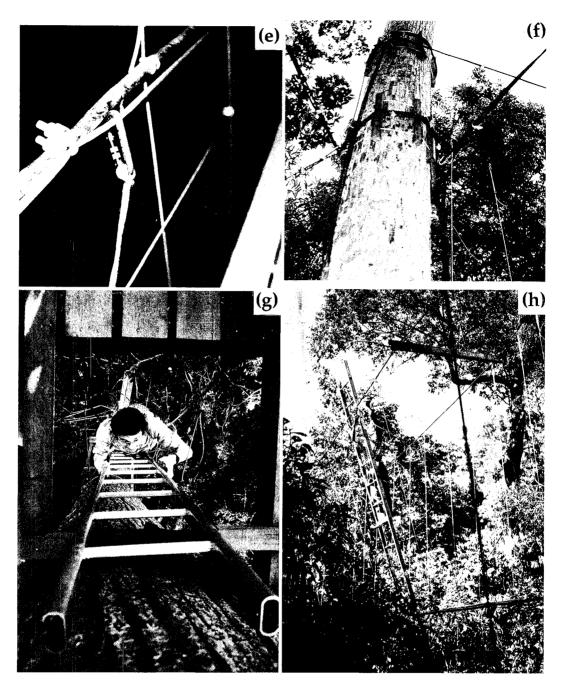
(continued). (e) a safety cable, (f) supporting cables on the pier tree of W7 and W8, (g) climbing the aluminum ladder from W8 to W9, (h) construction of W7.
